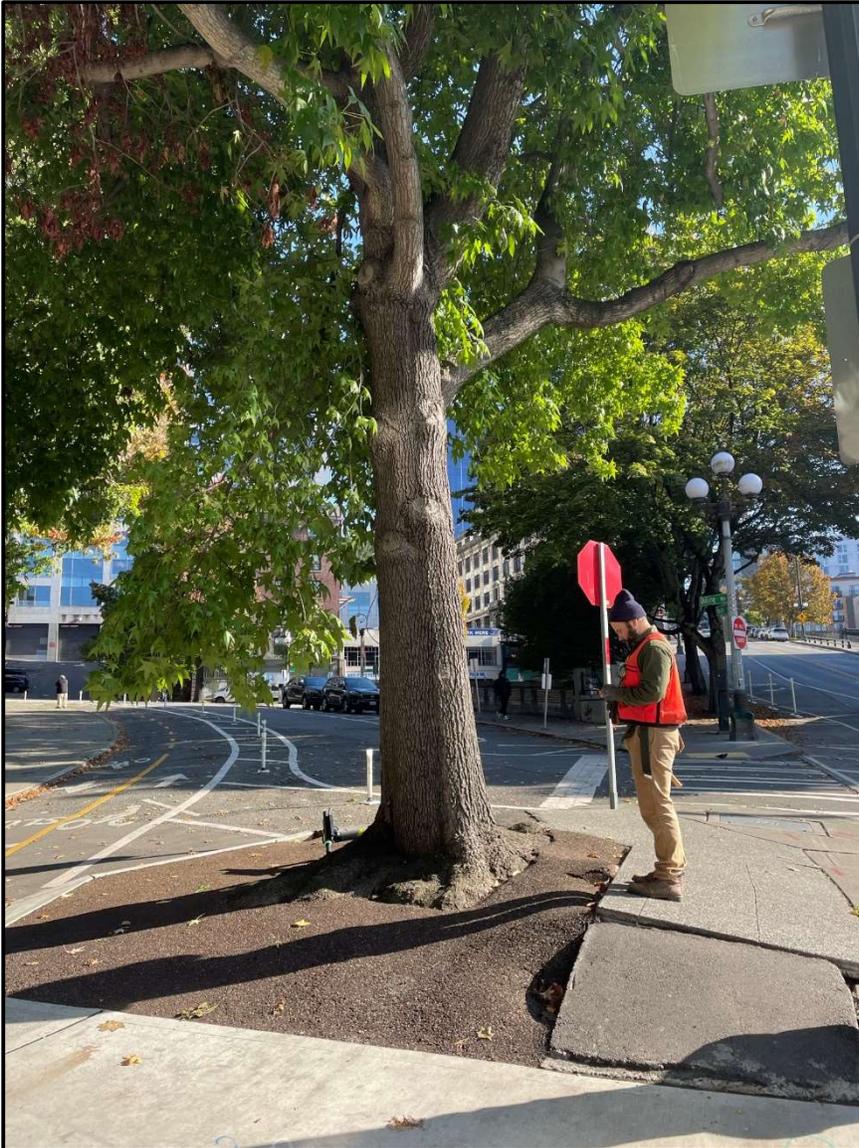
Street tree #TRE-1084223 has considerable sidewalk uplift.
